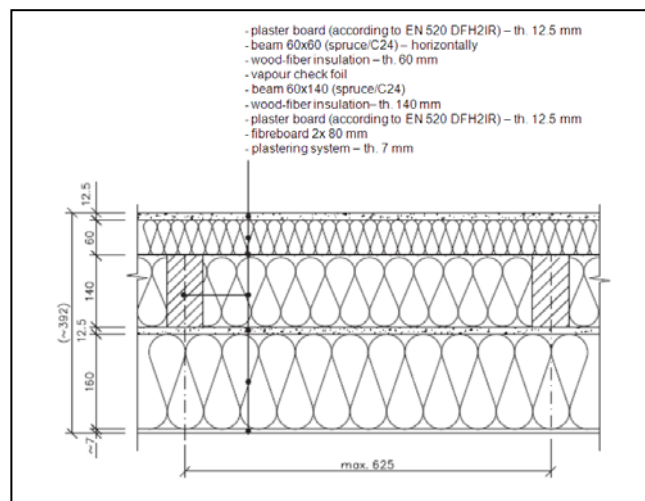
A wall with the diffusion porosity structure (author's archive).
